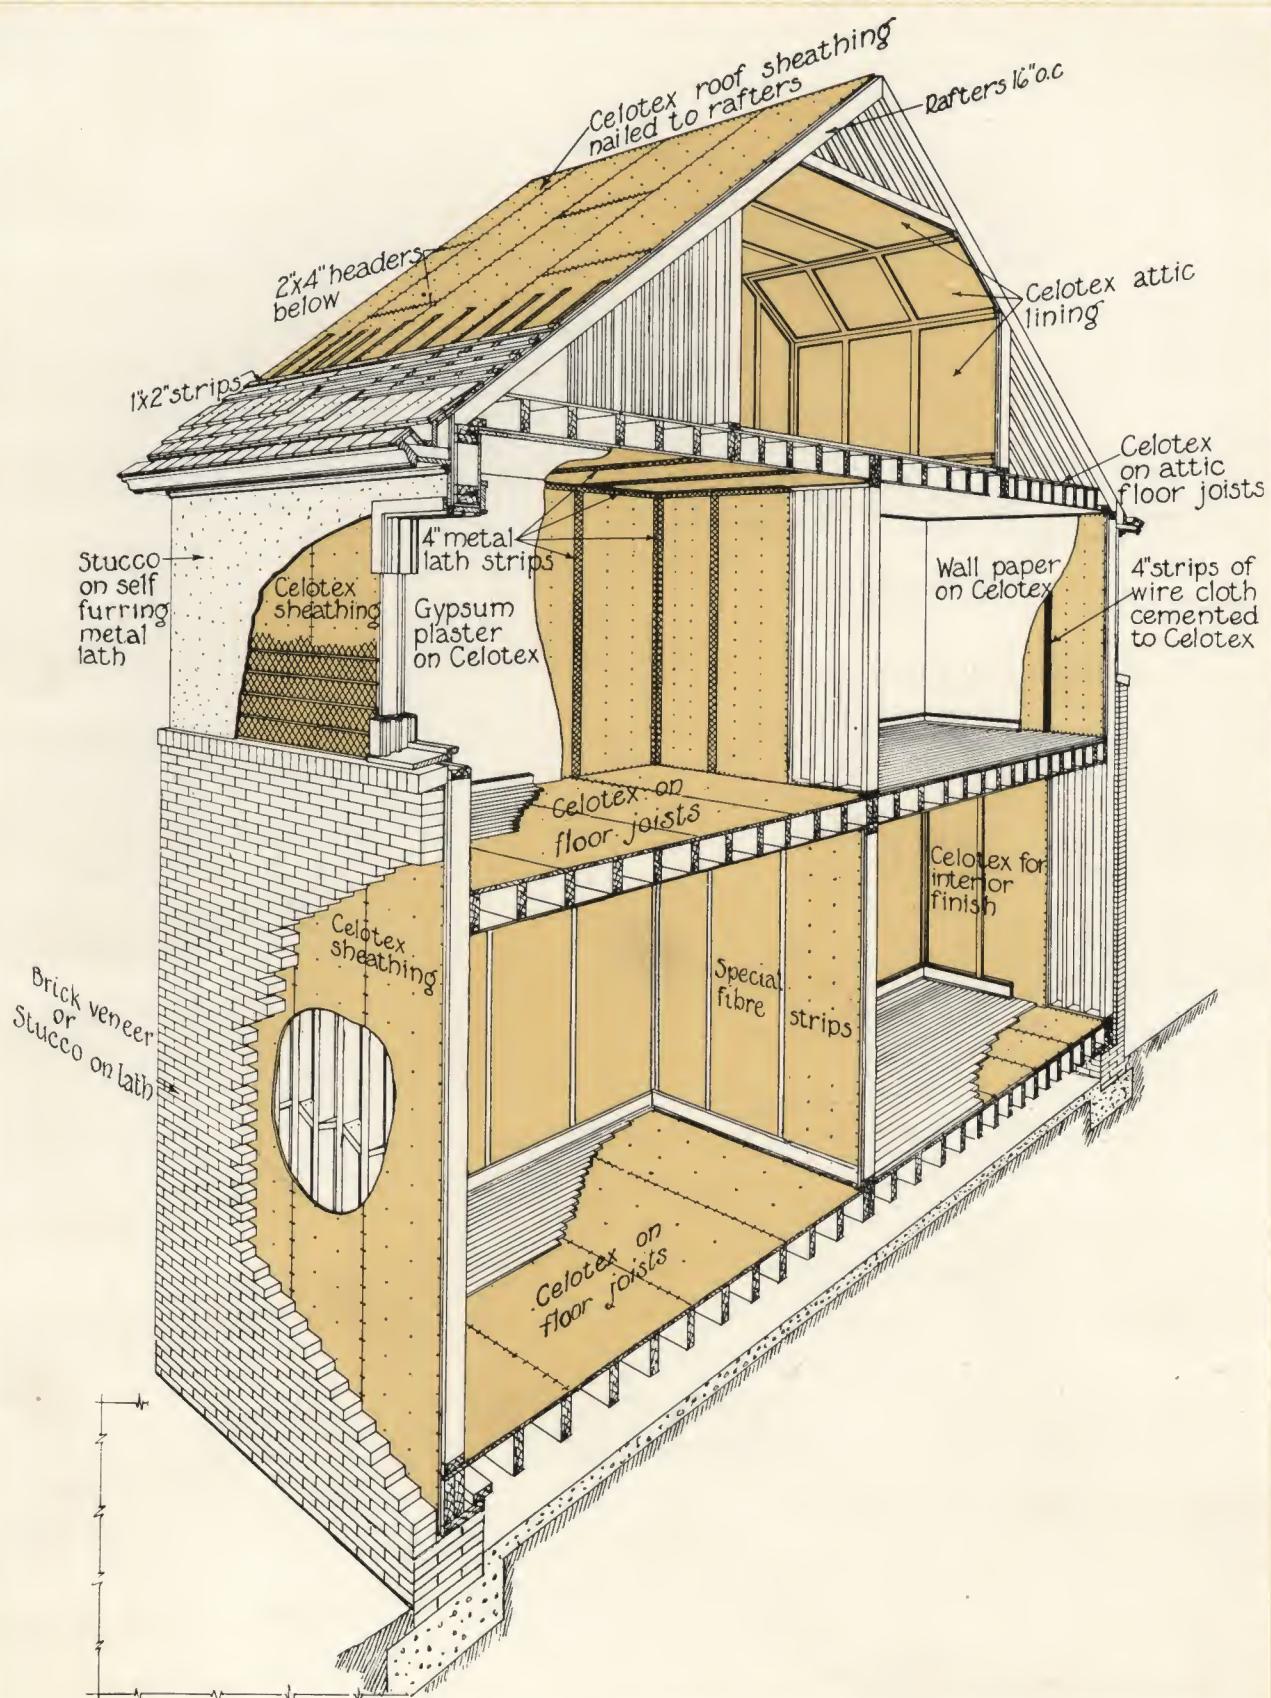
SECTION OF BUILDING SHOWING TYPICAL USES OF CELOTEX
